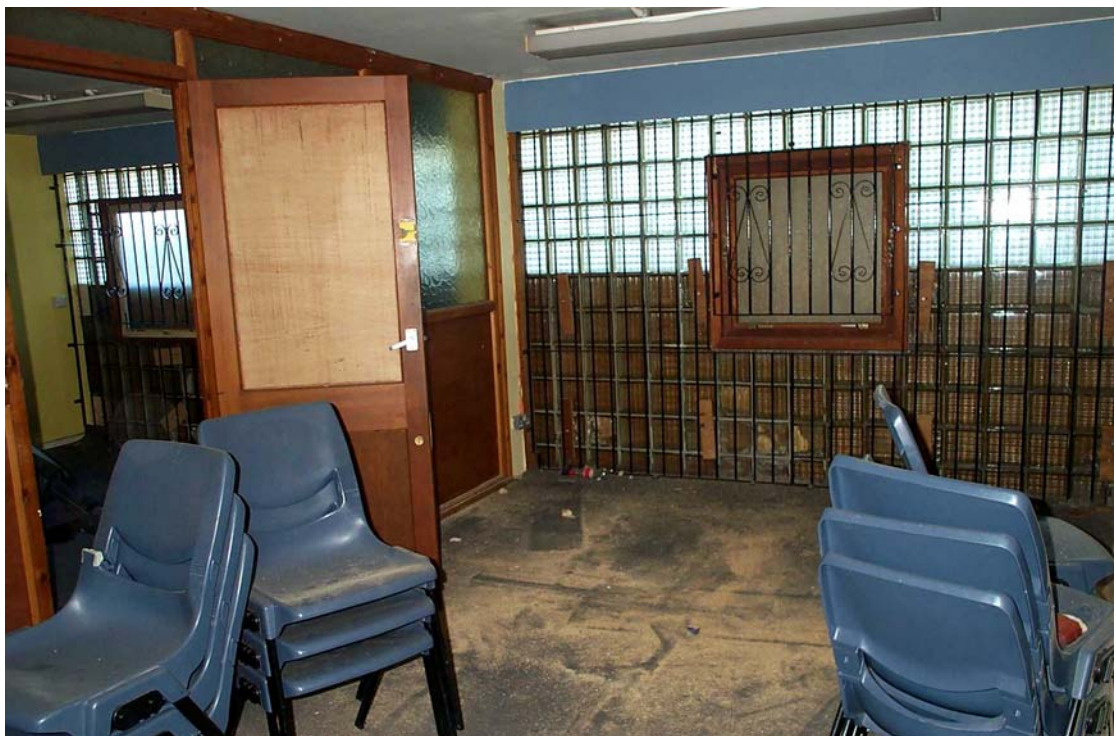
North-west aspect of the Principal's Room (Room 17), Ground Floor
